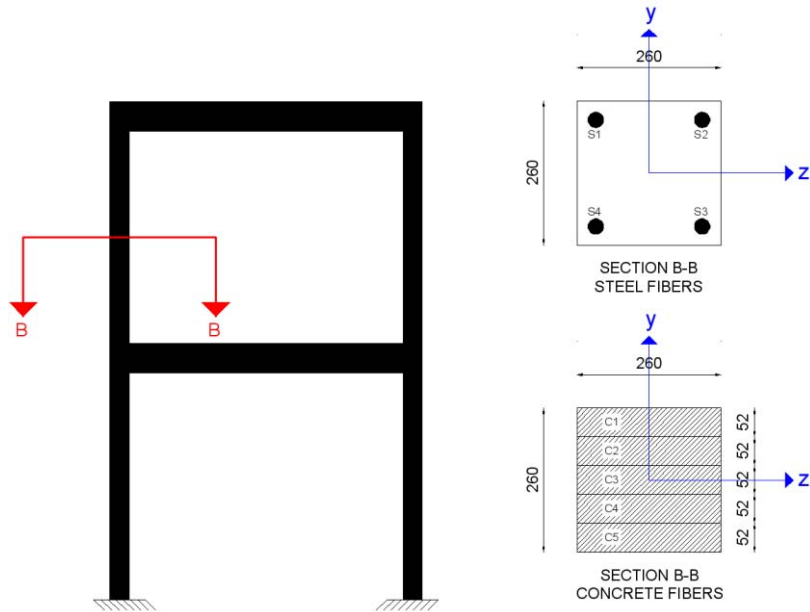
Fibers cross section for 2<sup>nd</sup> floor columns in both bare frame and CFRP retrofitted frame.
